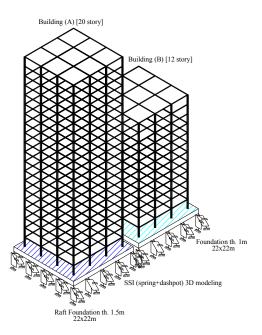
3D view of the two adjacent buildings with raft foundation system
